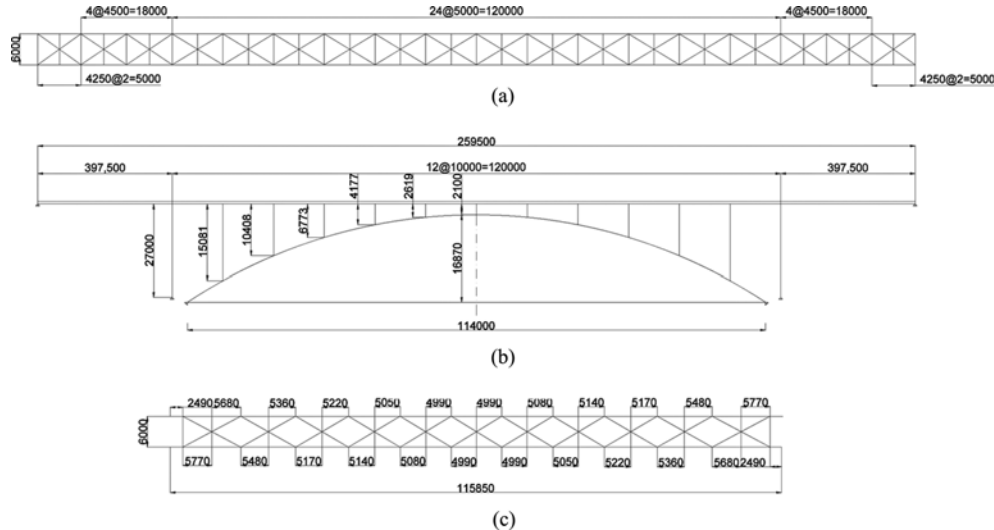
Structural Layout of the Arch Bridge (unit: mm): (a) Top View, (b) Elevation, (c) Top View Arch Rib
